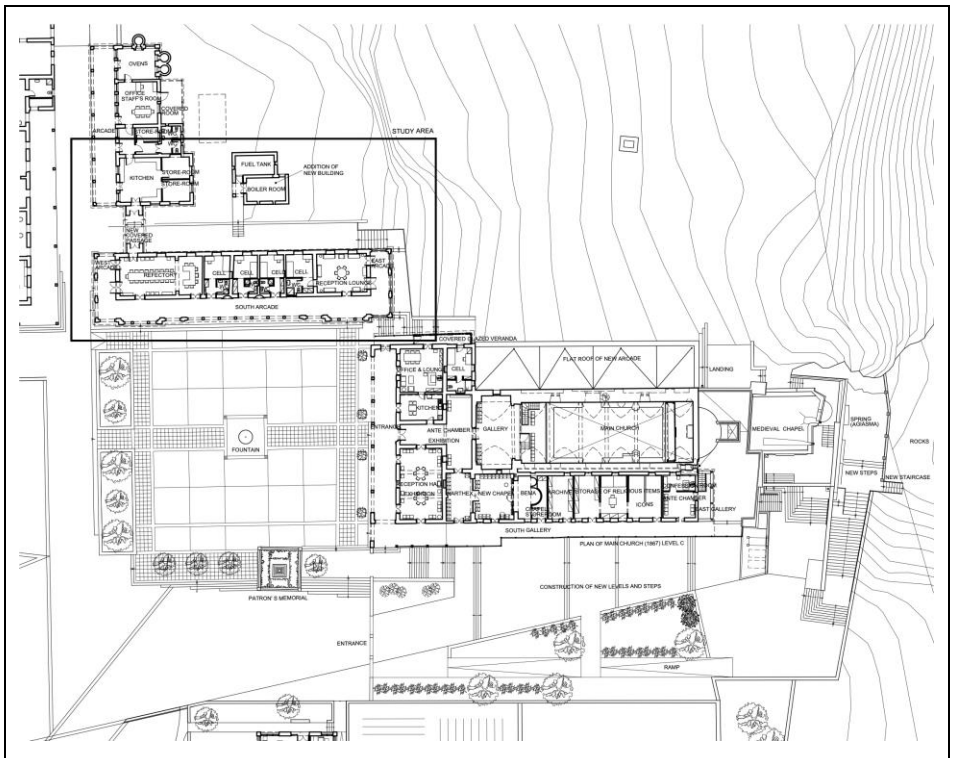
Ground Floor Plan Drawing of the Monastery (UNDP, 2016)
